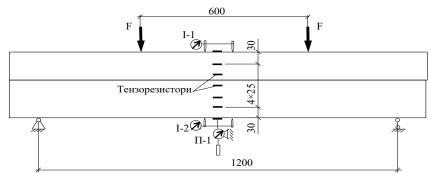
Scheme of loading during experimental testing of concrete beams and placement of measuring instruments
